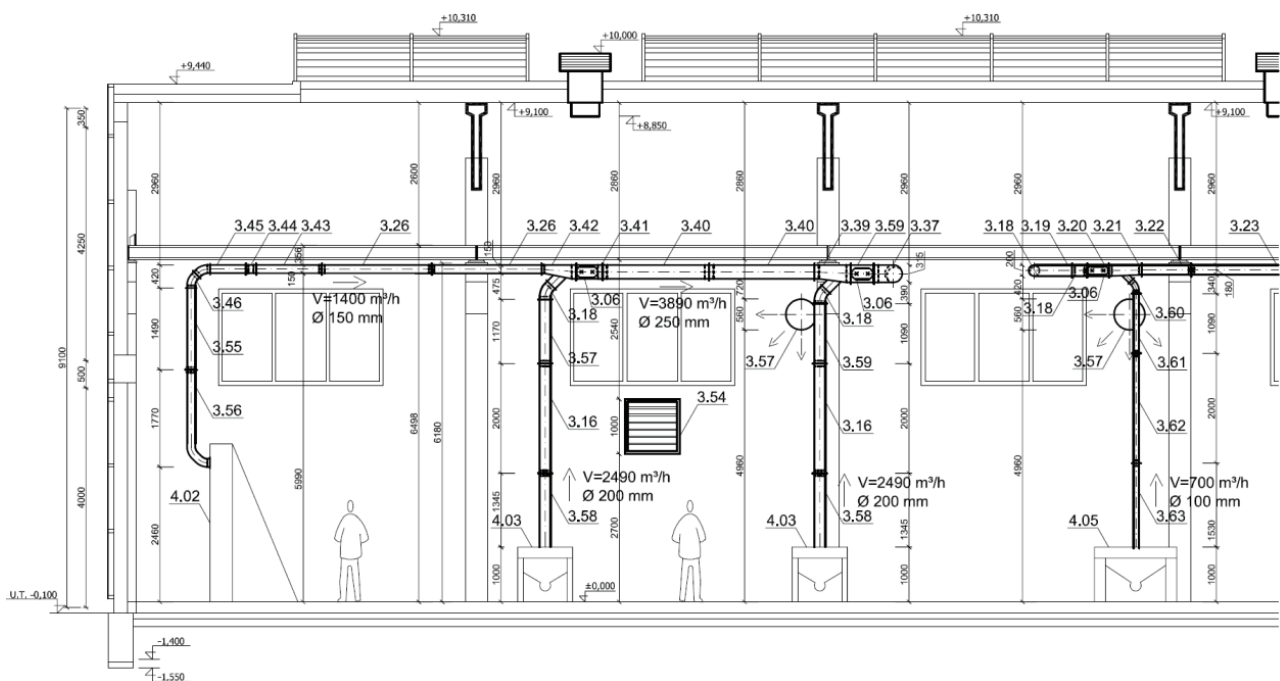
Local exhaust equipment – Cross section of industrial building with woodworking operation [13]
